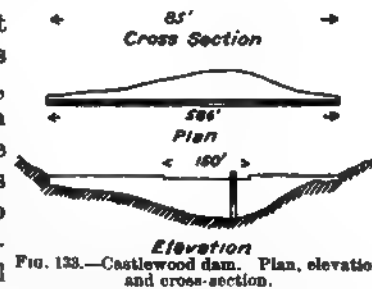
Castlewood dam. Plan, elevation and cross-section.
